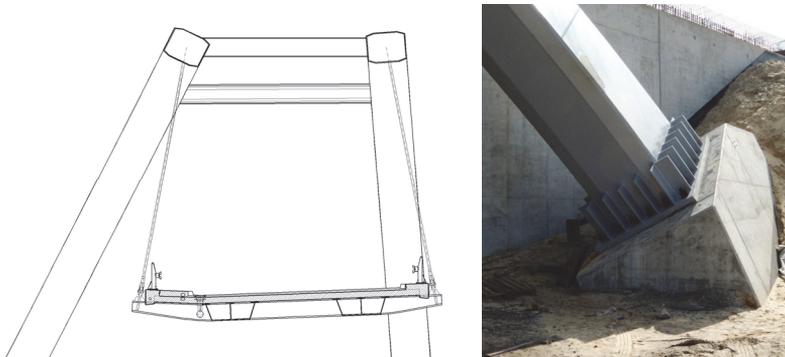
Cross-section and fixing of the arch in the abutment [4]
